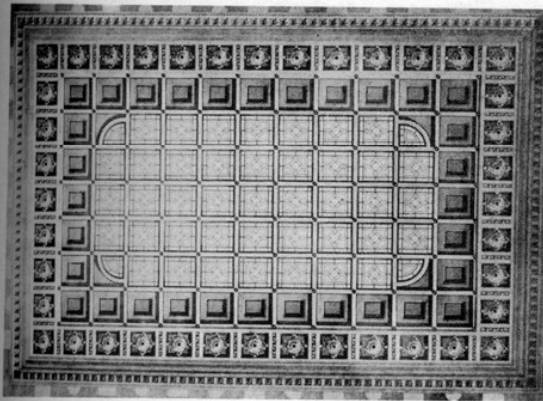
Plan of ceiling dated March 28, 1856. The visible ceiling was of cast iron elements cast in New York and stained glass from Philadelphia. Drawing dated March 28, 1856.
